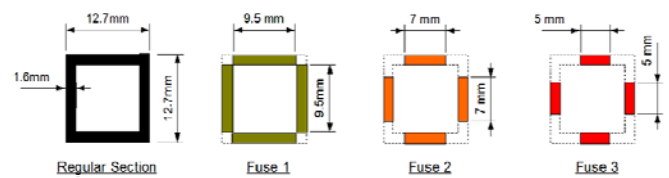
Member cross sections used throughout the building models (units: model scale).
